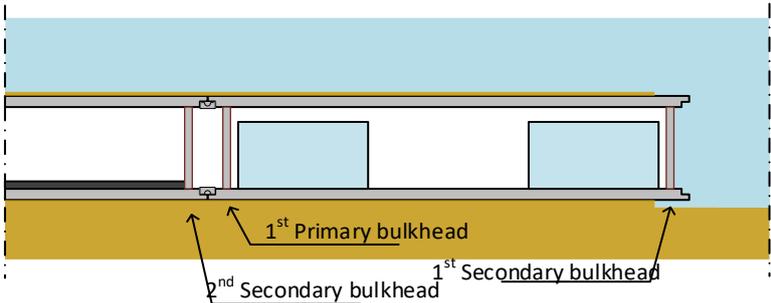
, BULKHEAD FAILURE SAFETY, LONGITUDINAL VIEW
